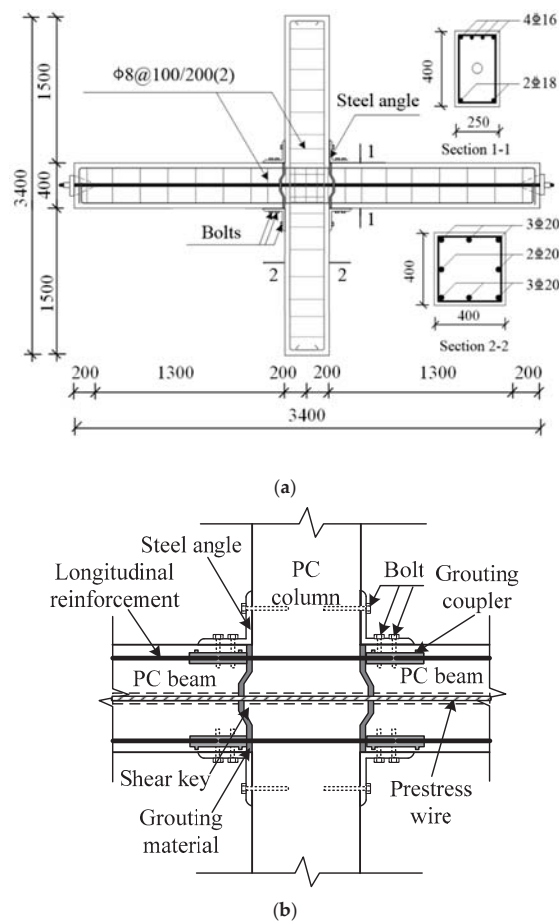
Design dimensions and reinforcement of the HPC connection: (a) details of the dimensions and reinforcement of the HPC connection; (b) details of the HPC connection.
